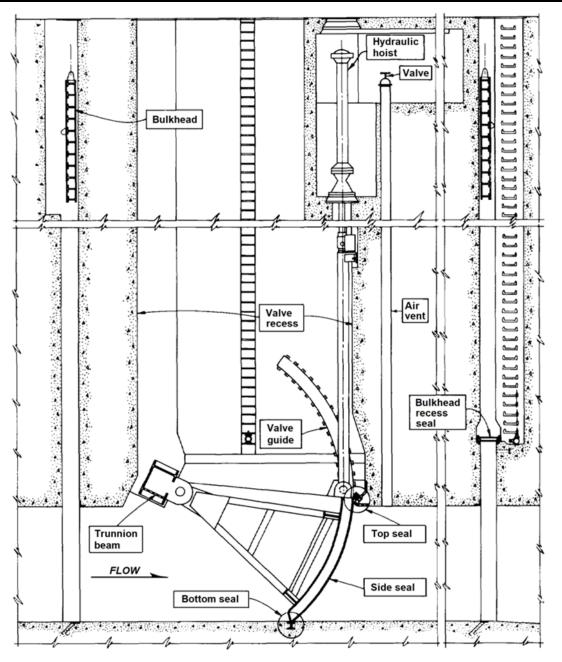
Elevation view of typical reverse tainter valve and hoist
